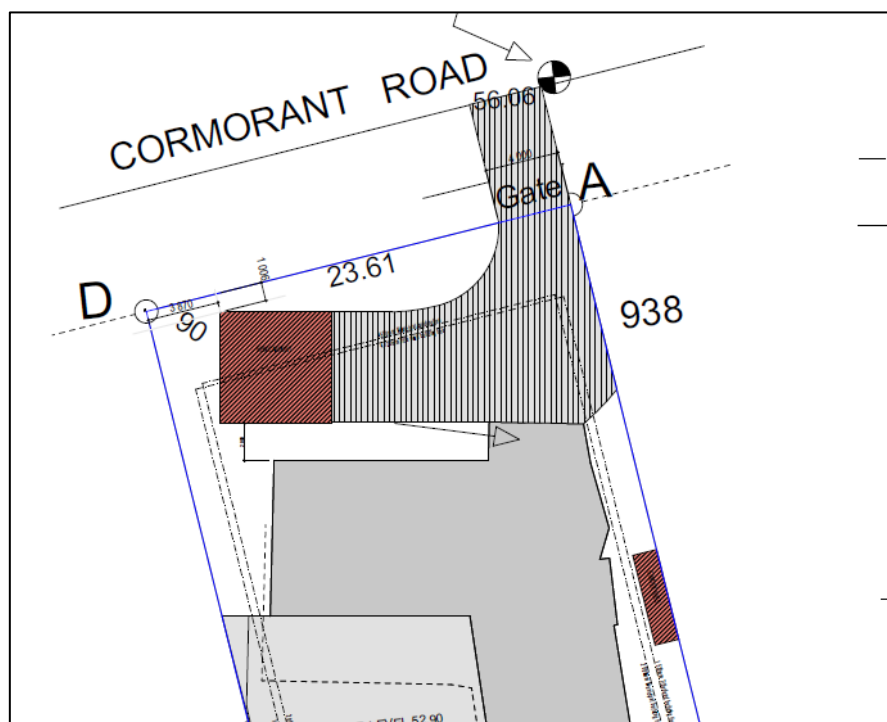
EXTRACT - PROPOSED ADDITIONS TO EXISTING DWELLING HOUSE
